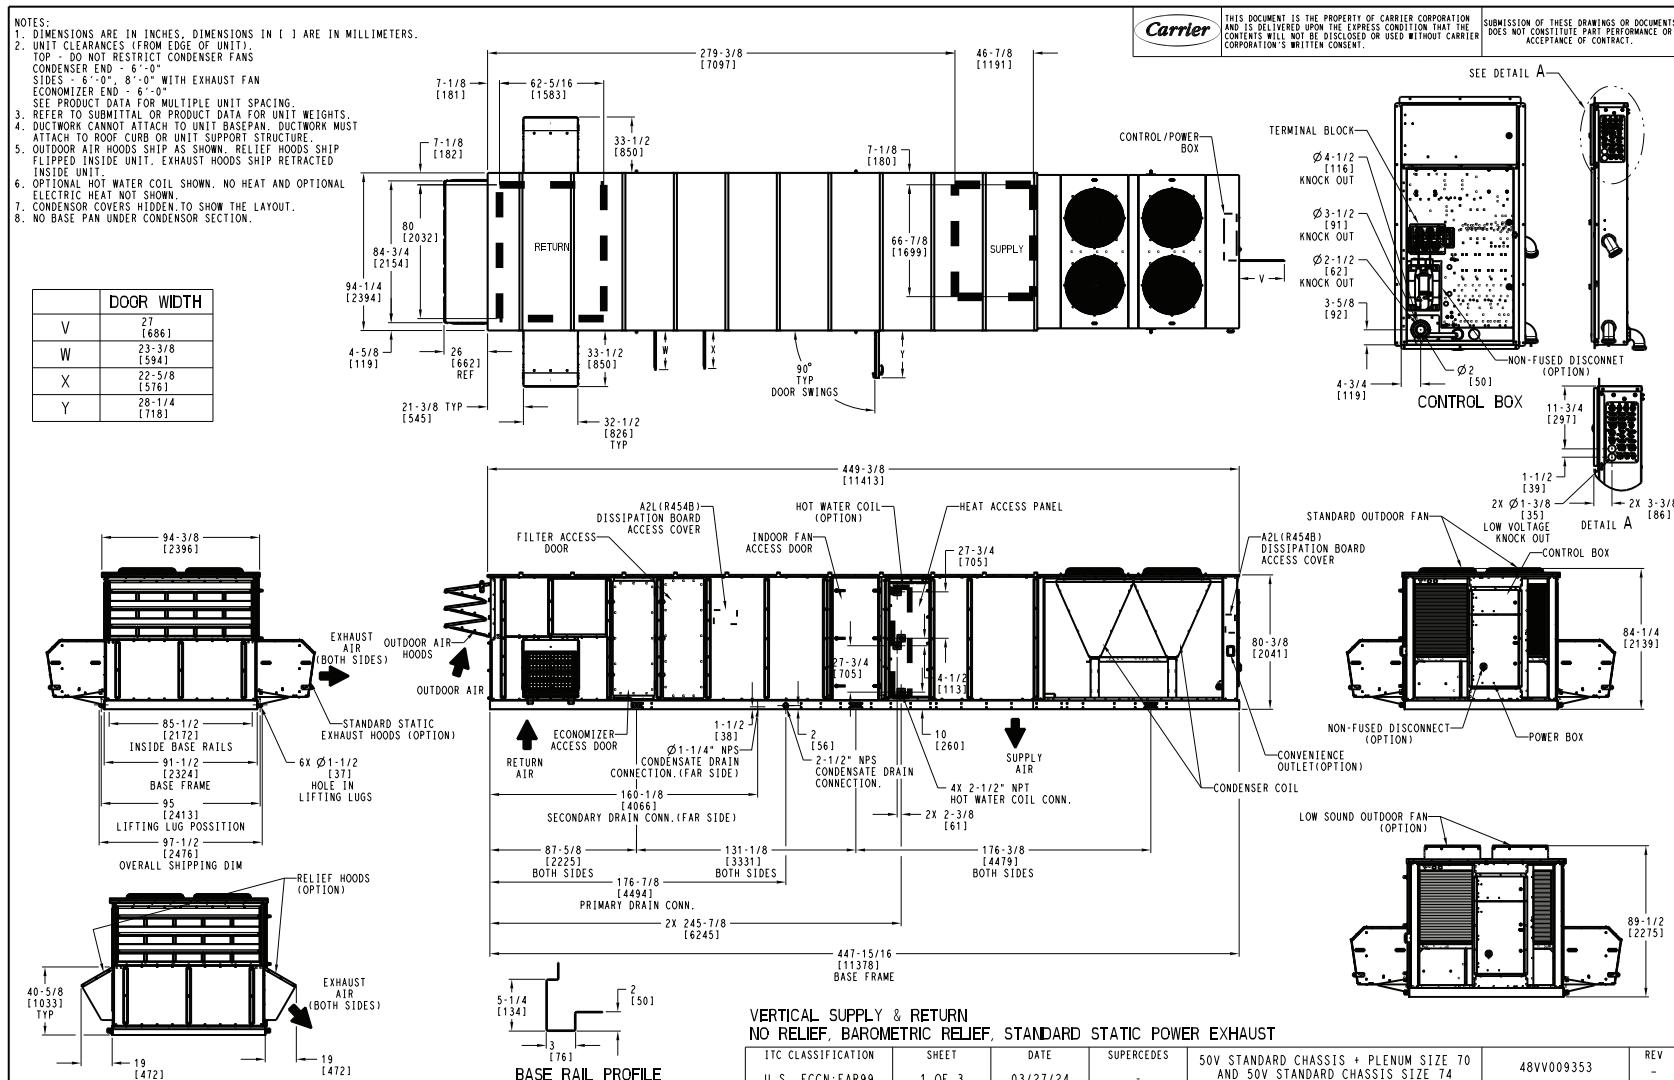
50V 70 Ton Standard Chassis with Plenum Section and 50V 75 Ton Standard Chassis
